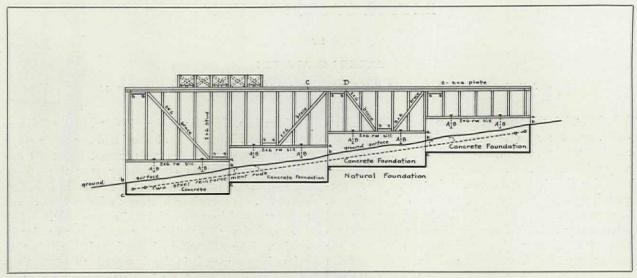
Properly Braced Underpinning on Reinforced Stepped Foundation, with Anchor Bolts
